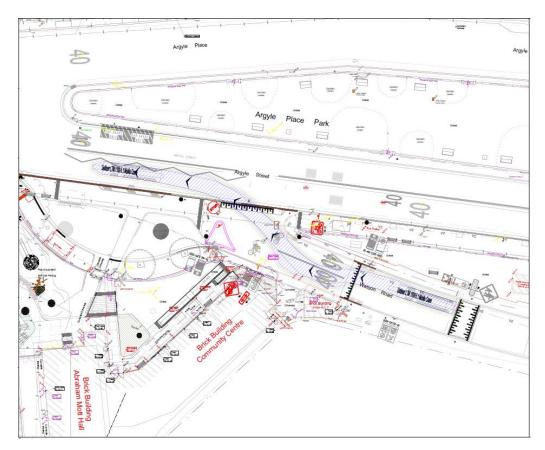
Mobile crane exit from Watson Road to Argyle Street
